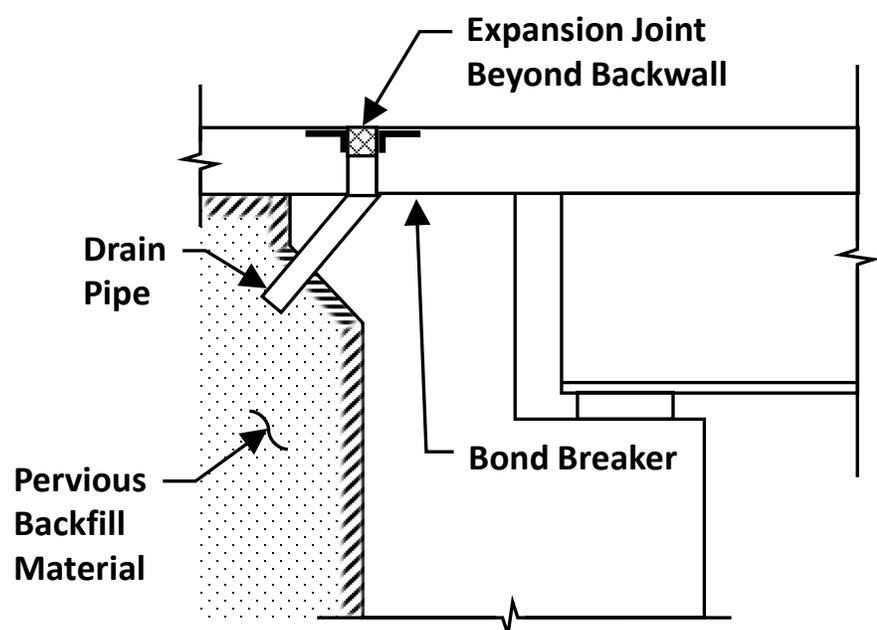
Example of locating the expansion joint at the back of the backwall.
